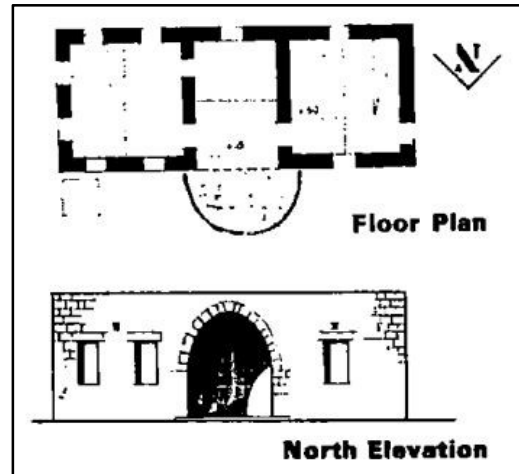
(a) Plan of Liwan House. (b) Elevation of Liwan House. Source: (Ragette, 1974) Accessed: 22-1-2021
